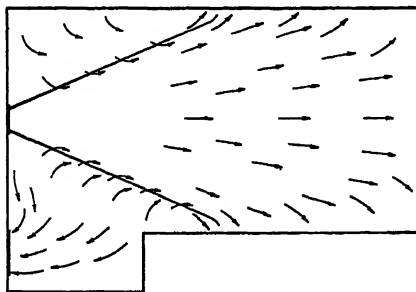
PLAN VIEW CORRECTLY LOCATED RETURN OUTLET ELIMINATING STAGNANT SPACE
